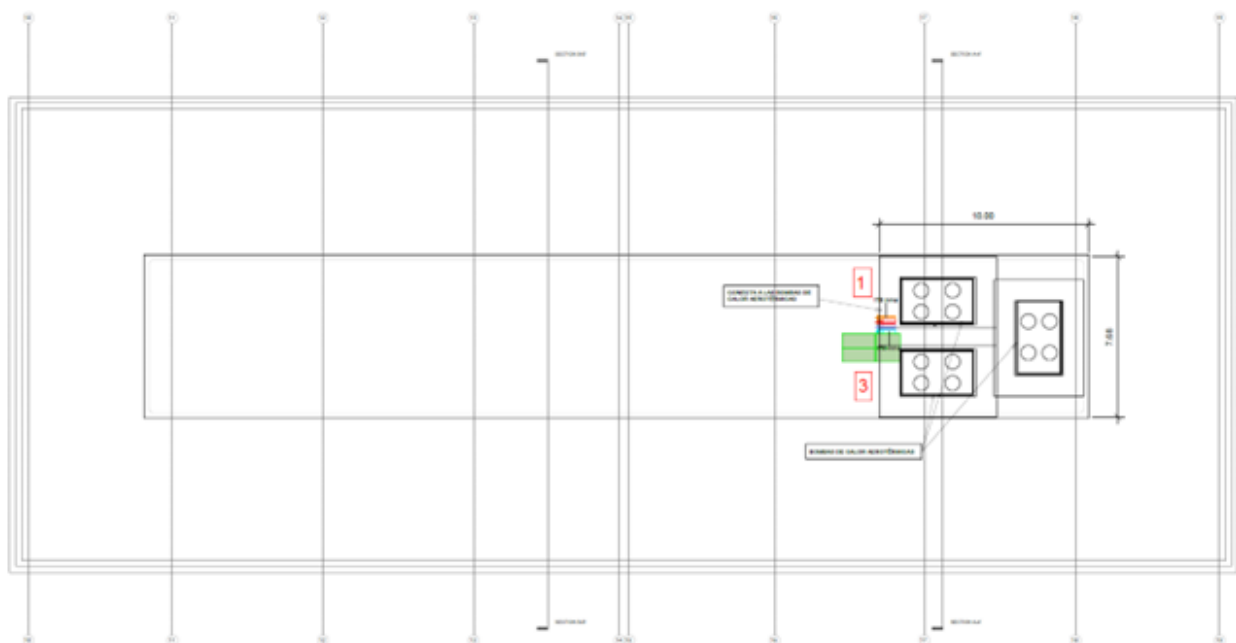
Aerothermal equipment on roofed plant (source: AIGUASOL).
